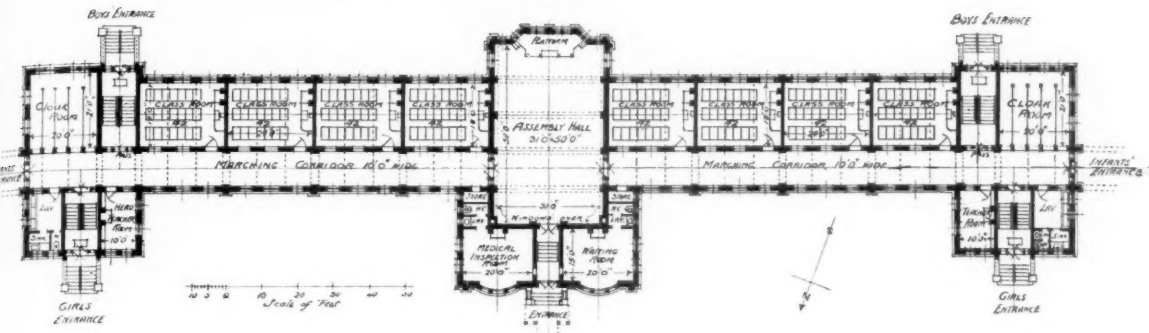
DURNSFORD SCHOOL, WIMBLETON: PLAN OF UPPER GROUND FLOOR.
